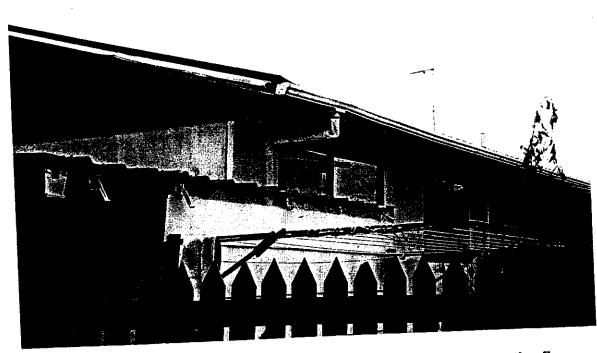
Deformed guttering and downpipe 6m away from the fire.
